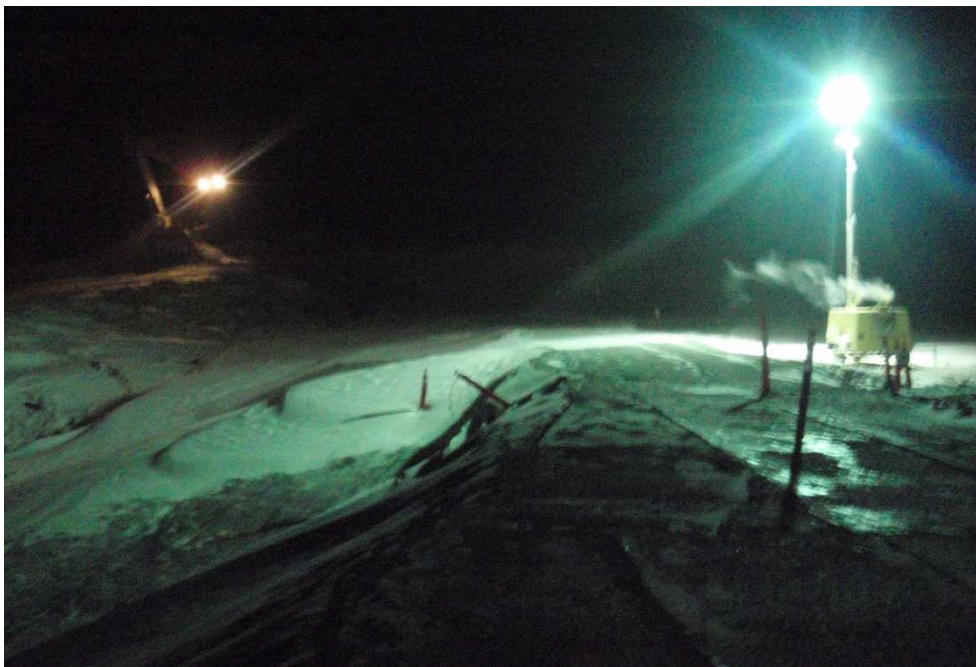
View of snow drifting into the underbuilt SSE upstream portion of the dam.
